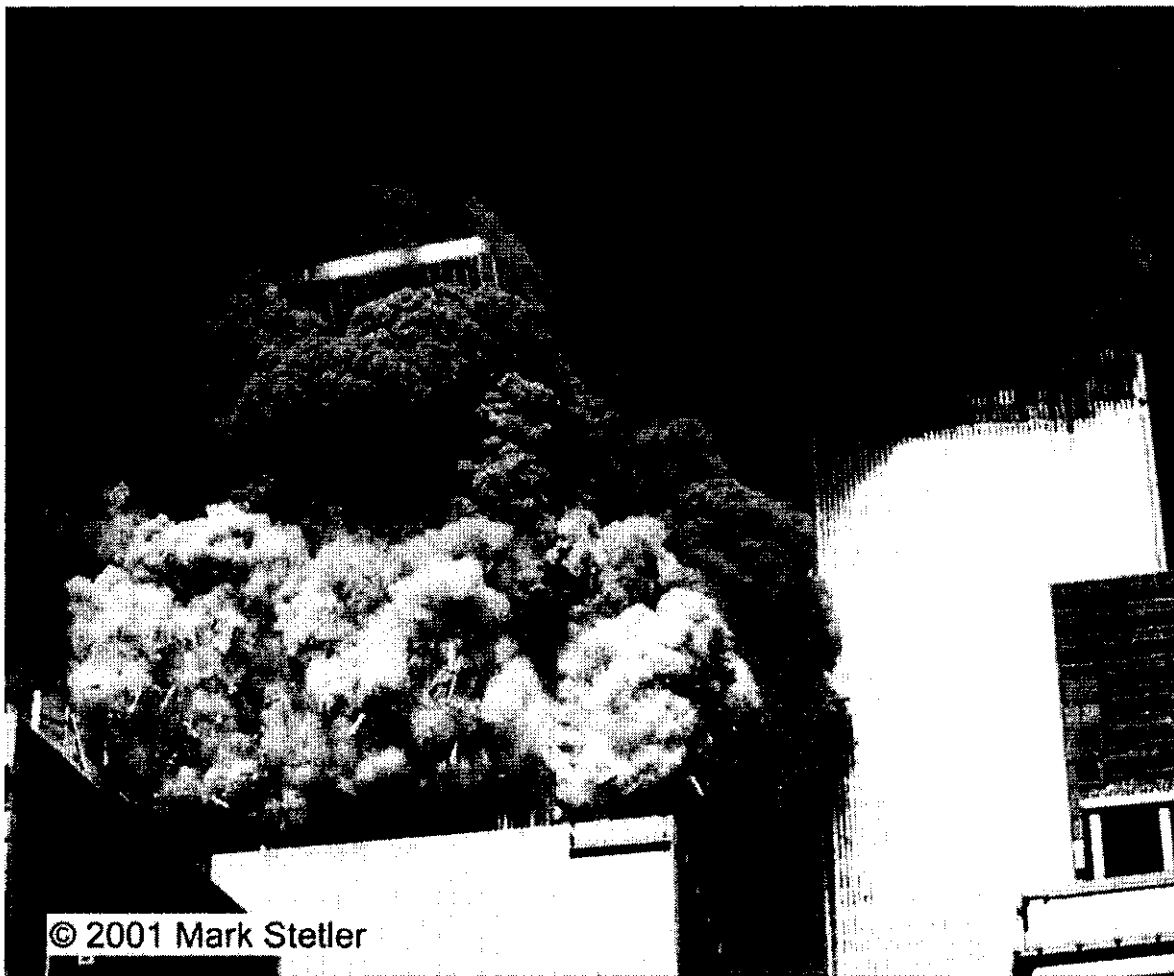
Photograph of WTC 2 tilting to the southeast at the onset of collapse.
